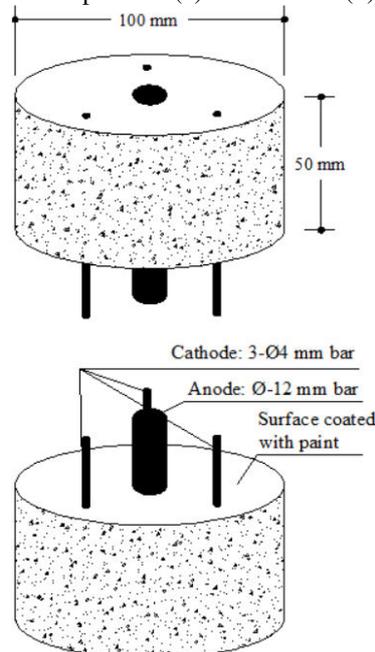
Details of Cylindrical Plates (a) Top View (b) Bottom View
